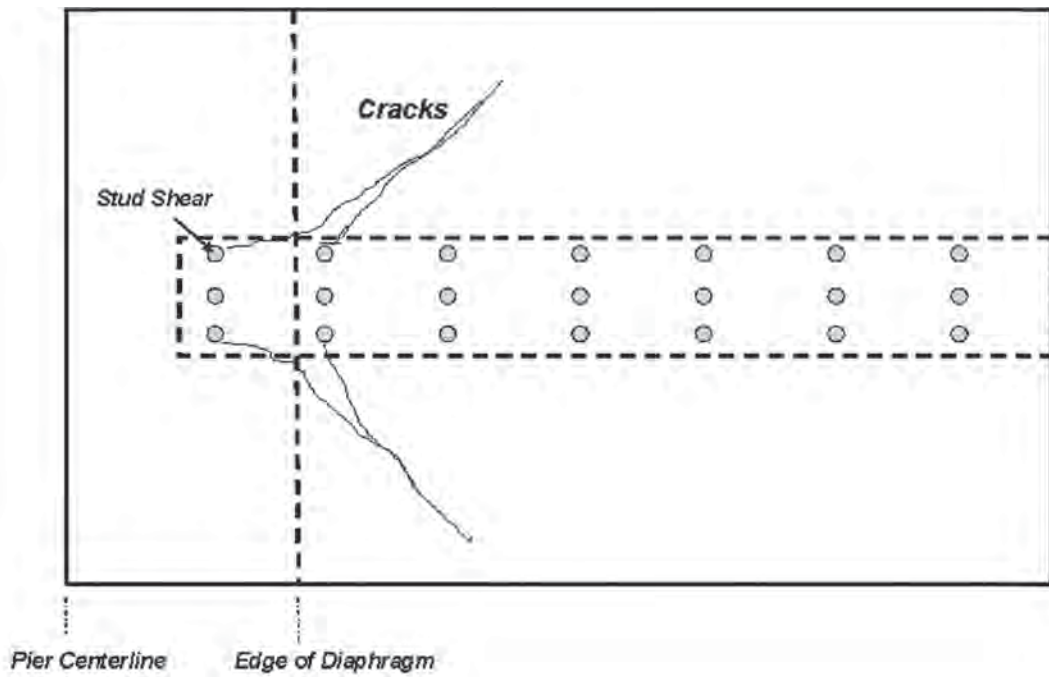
Concrete failure of the specimen 2 deck.
